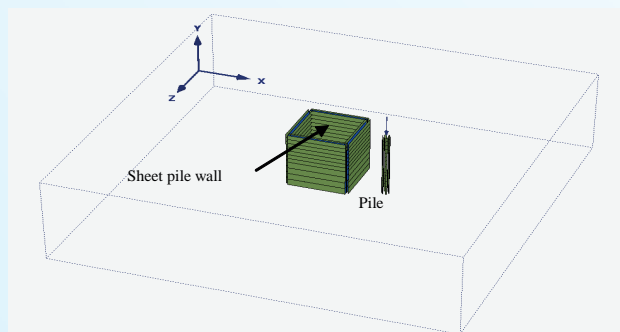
(b): 3-d view of the pile adjacent to an excavation
